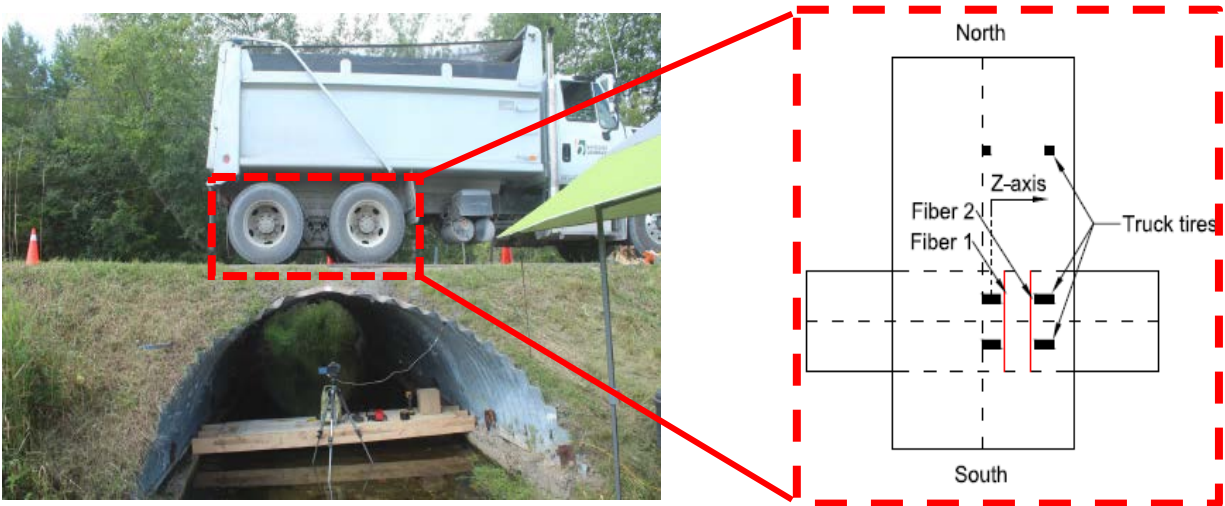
Test culvert, truck and the layout of the truck position over the culvert (Liu et al. 2020).
